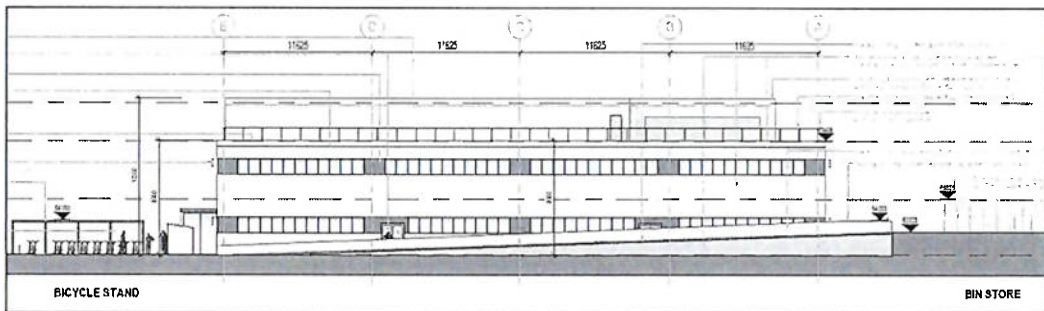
Proposed SASC northern elevation (Pascall + Watson, 2023).
